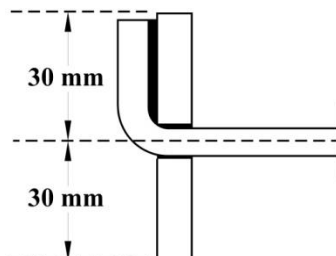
Steel plate in which the bar is welded to the rear face.
